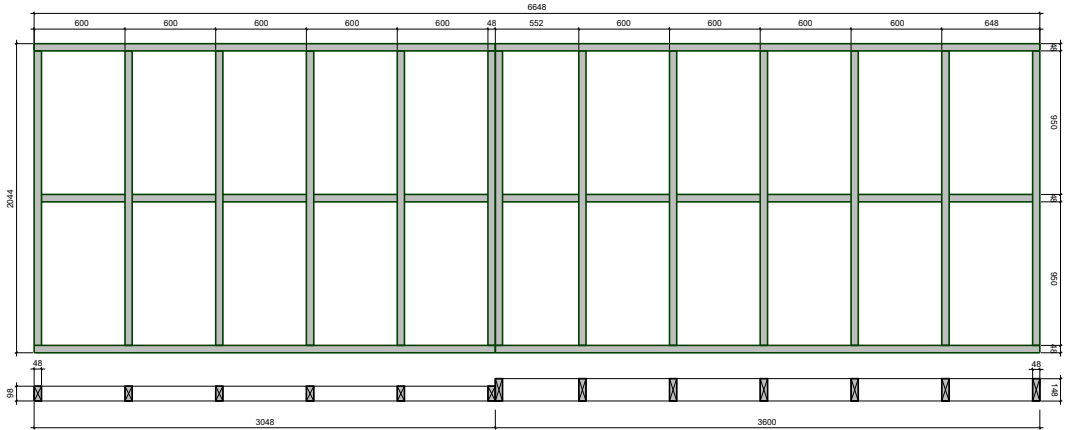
CONSTRUCTIONAL FLOOR PLAN BEFORE BUILD
